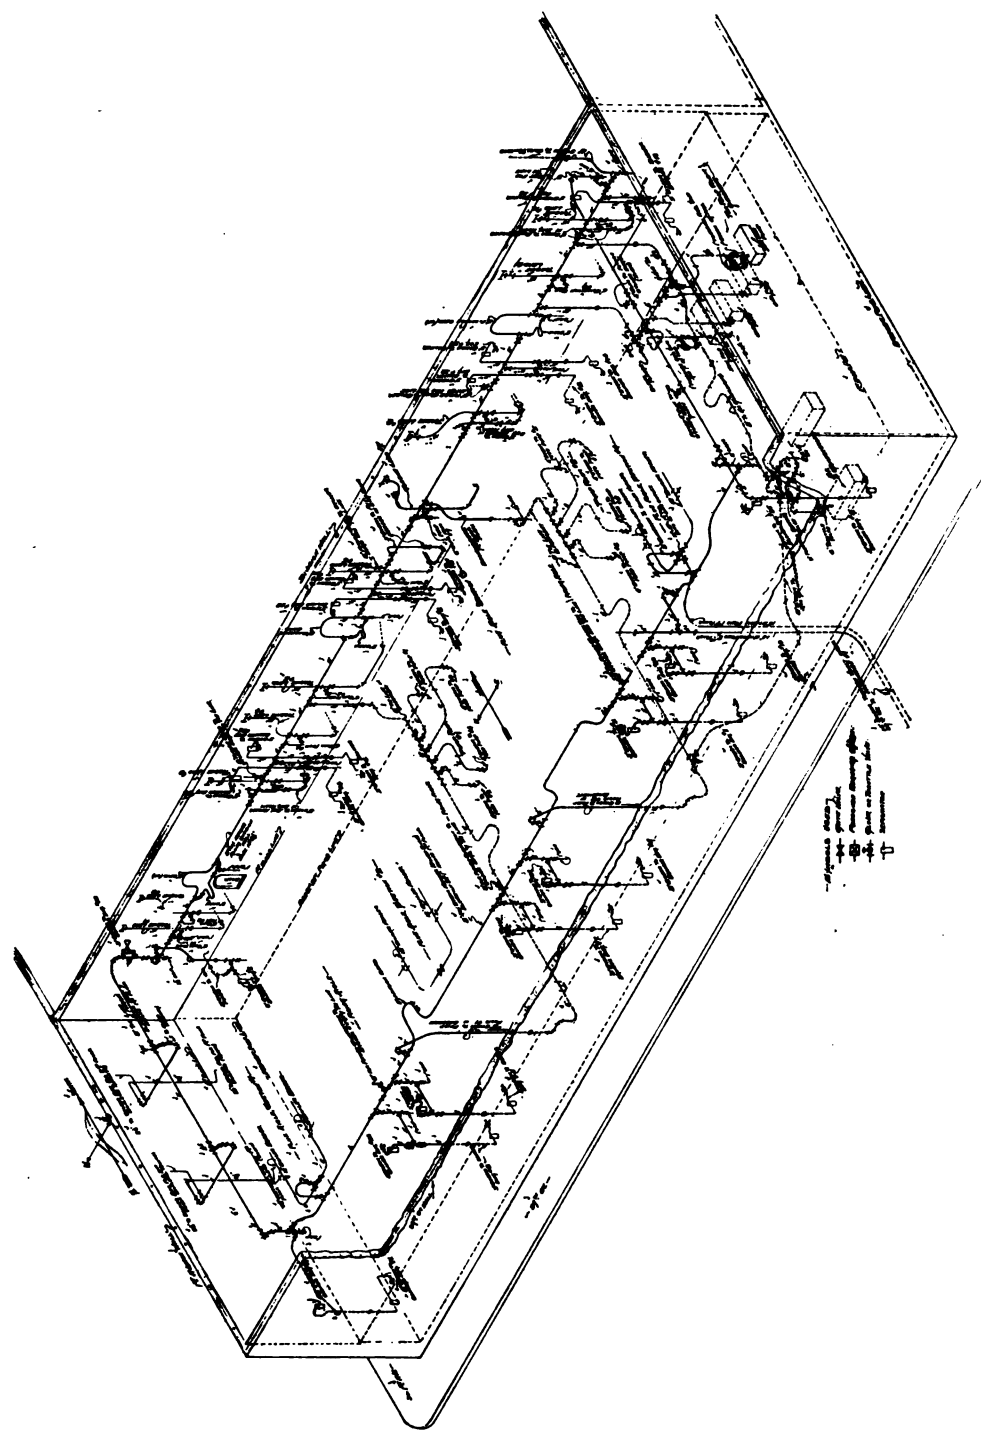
Eight-inch Auxiliary Steam Header, Boiler House, Waterside No. 2.
